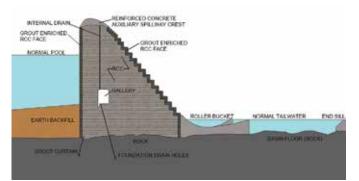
Grout-enriched section at Deep Creek Dam (© *illustration courtesy of Schnabel Engineering*)
